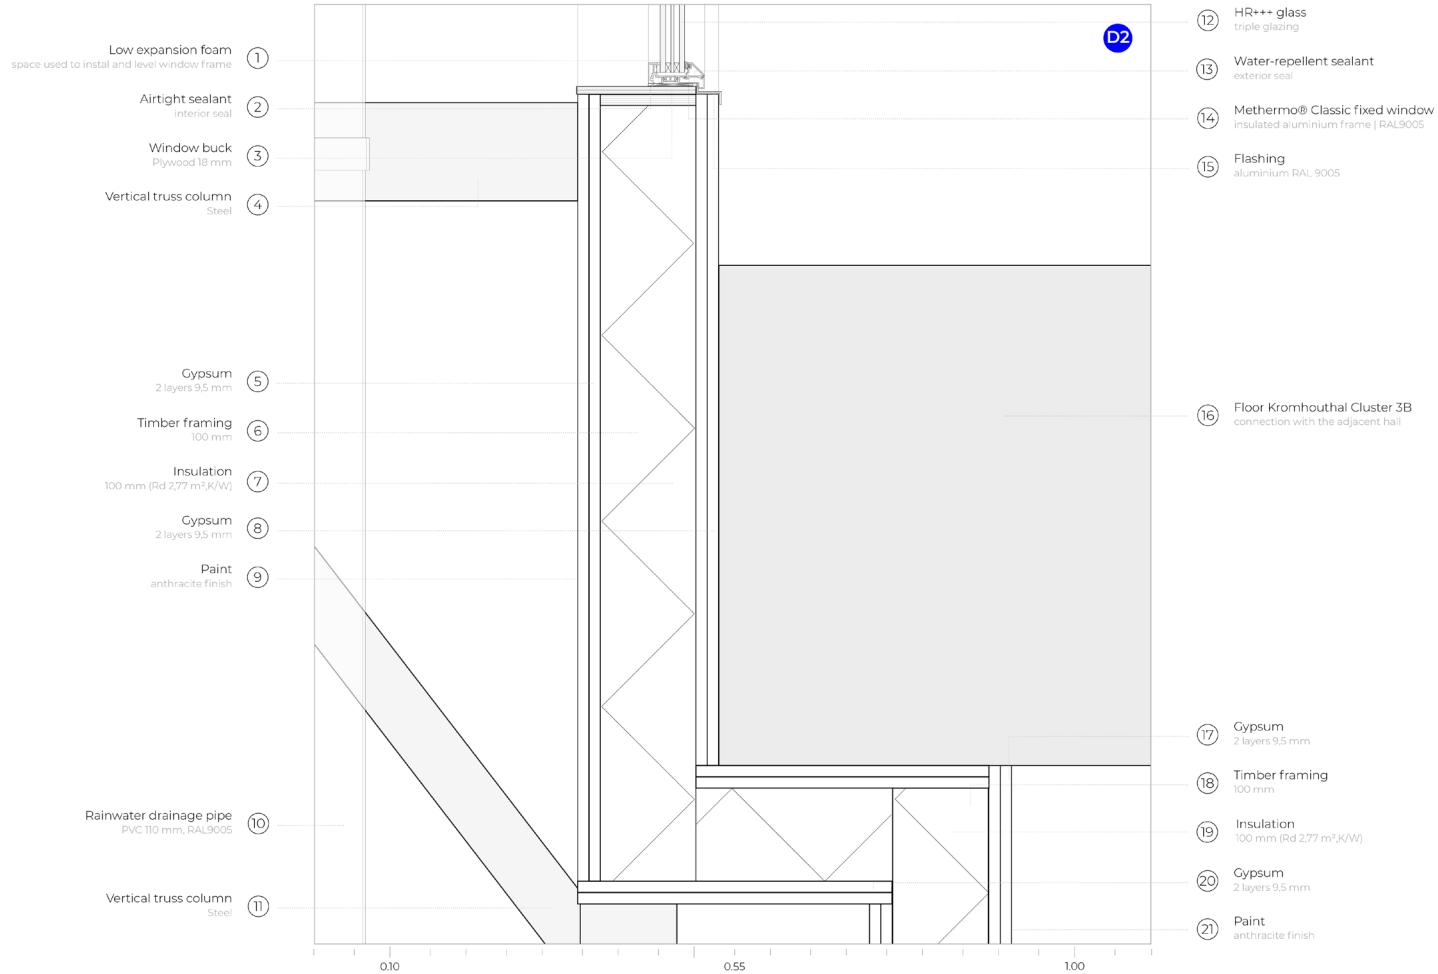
# DETAIL DRAWINGS | VERTICAL SECTION D | SCALE 1:10
